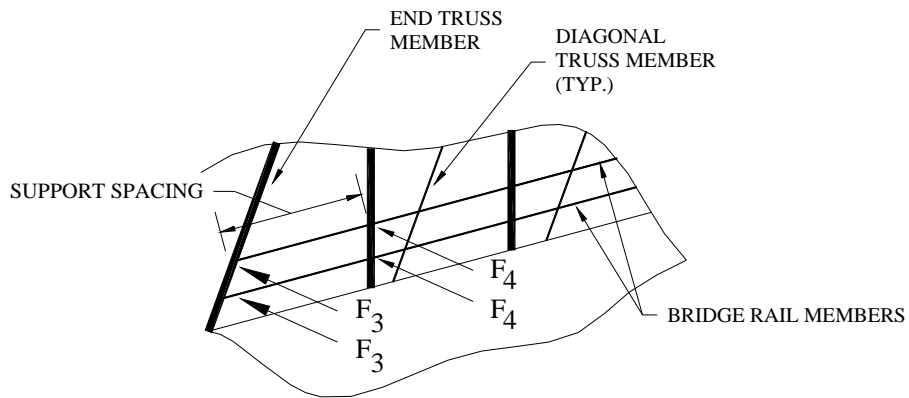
Configuration of Design Crash Loads at End Truss Members.
